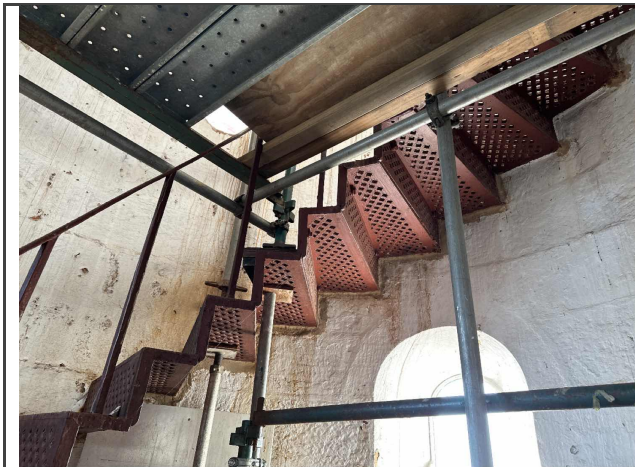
LOCATION: Internal, GF Entrance Stairs & handrails
